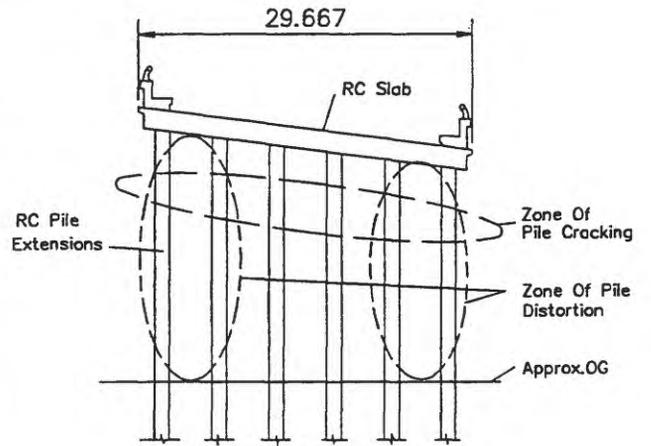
Elevation drawing of damage to pile extensions of Mococo Off-Ramp.
